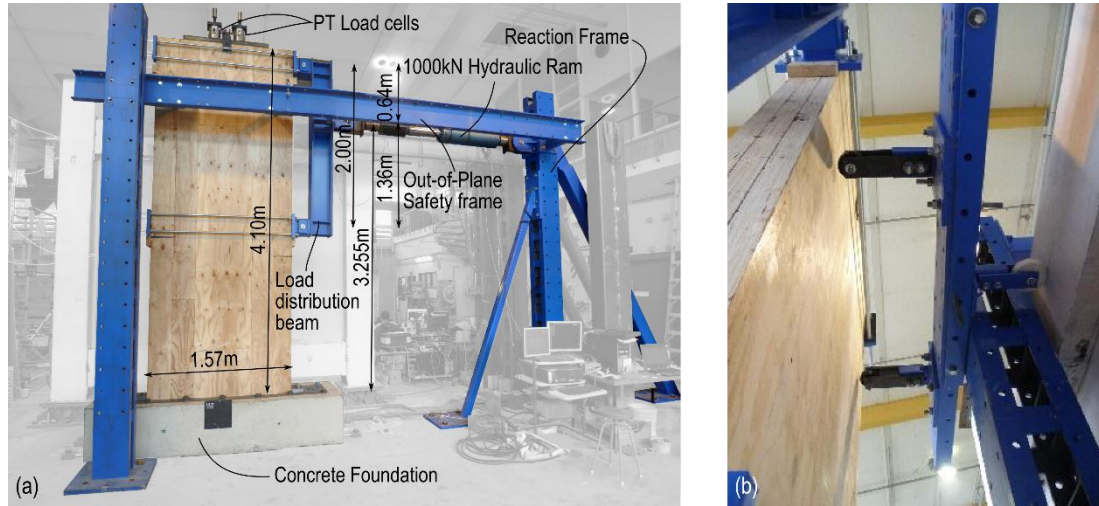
(a) Test setup. (b) out-of plane restraining beam detail.
